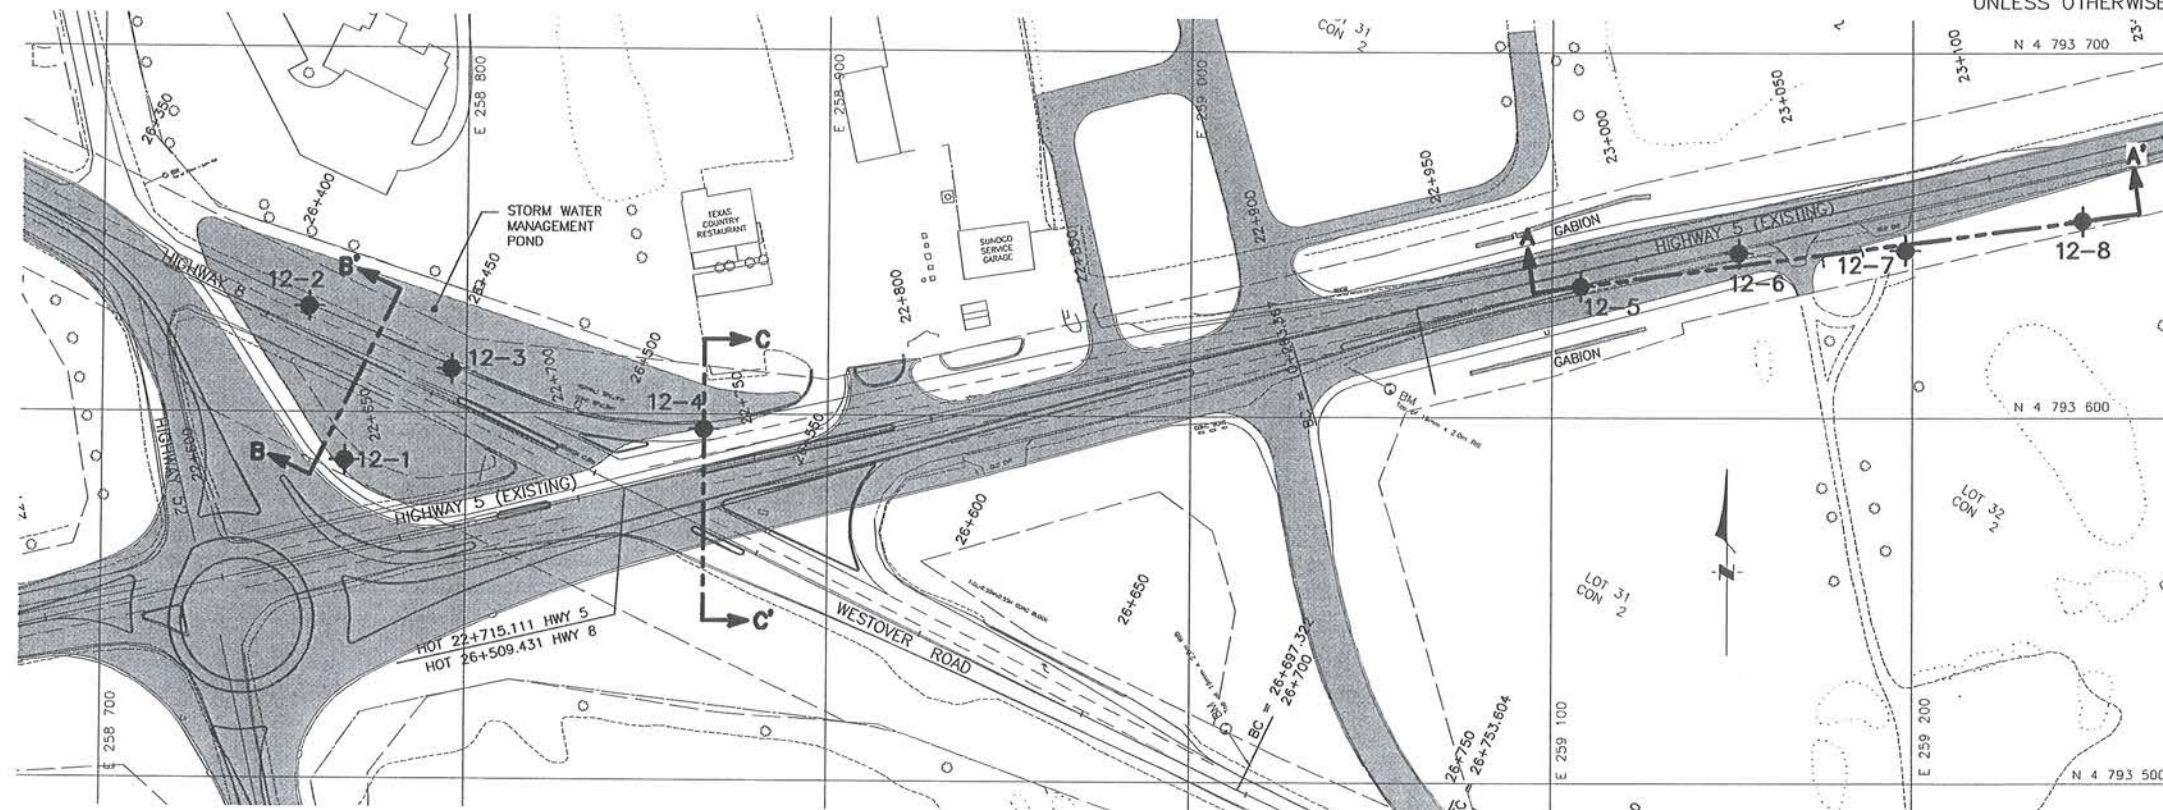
& 2 – Borehole Location Plan and Soil Strata Plot
